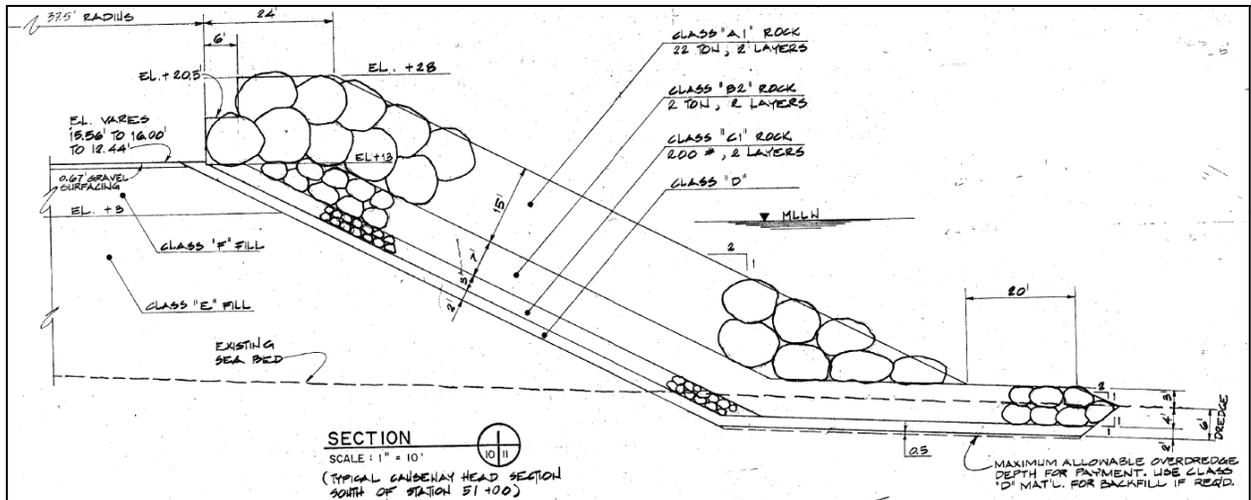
Typical Section – Causeway Armor Rock (USACE Design Drawing, 1984)
